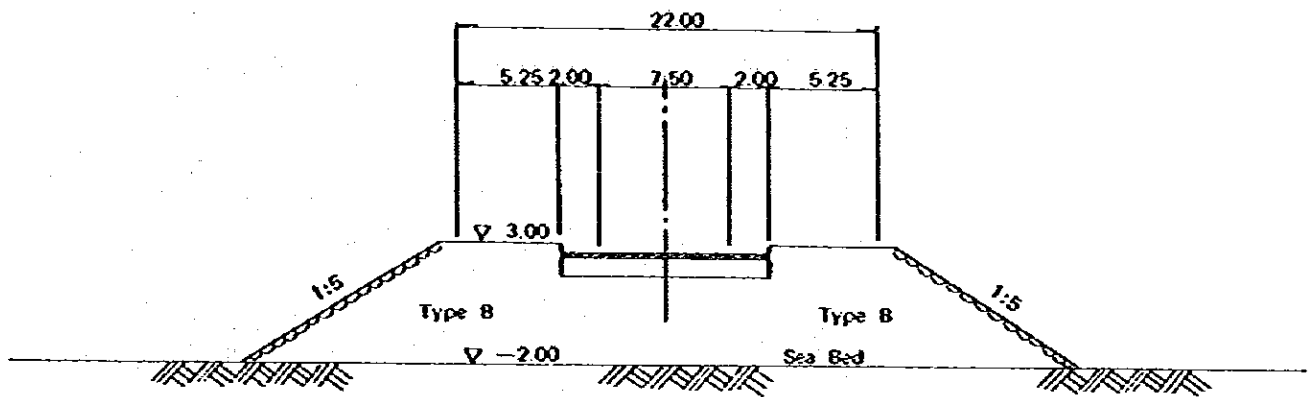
TYPICAL CROSS-SECTION OF APPROACH ROAD
